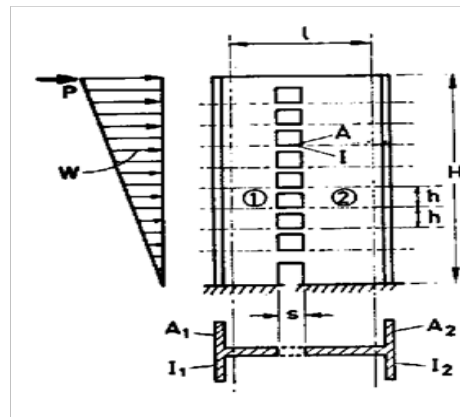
A Typical Coupled Shear wall Subjected to Lateral L
